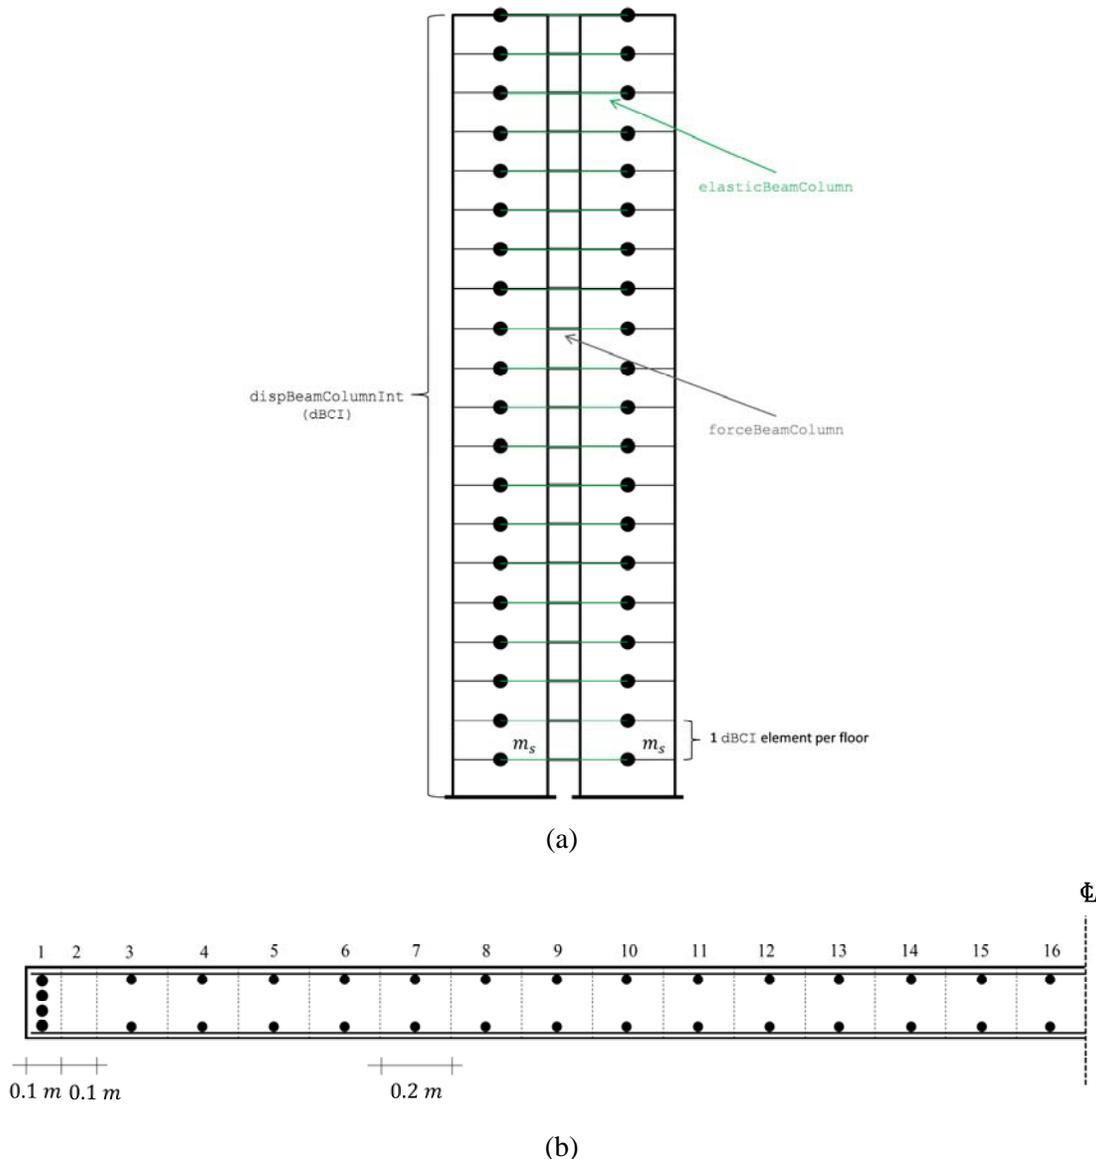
OpenSEES model of RC shear-wall building frame: (a) Elevation, (b) Plan view with considered fibers
